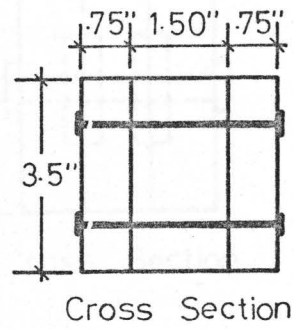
Dimensions and Connector Details for Type A-2 Connections
